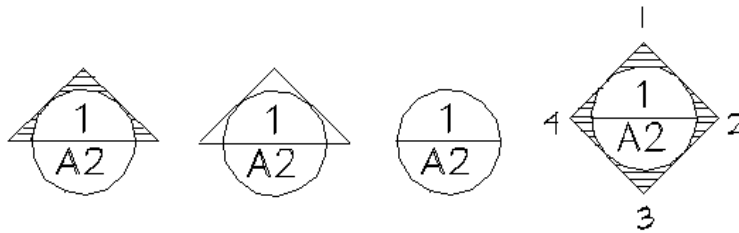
Elevation Marker examples. The far right one, drawn with 4-way, has had additional text added manually to the arrow points.
